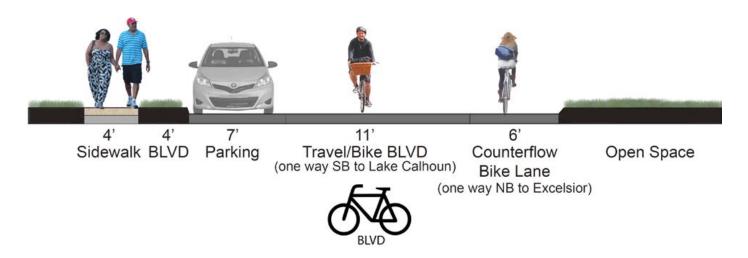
RECOMMENDATION 26E — WEST CALHOUN BOULEVARD — EXCELSIOR BLVD TO WEST 32ND STREET
